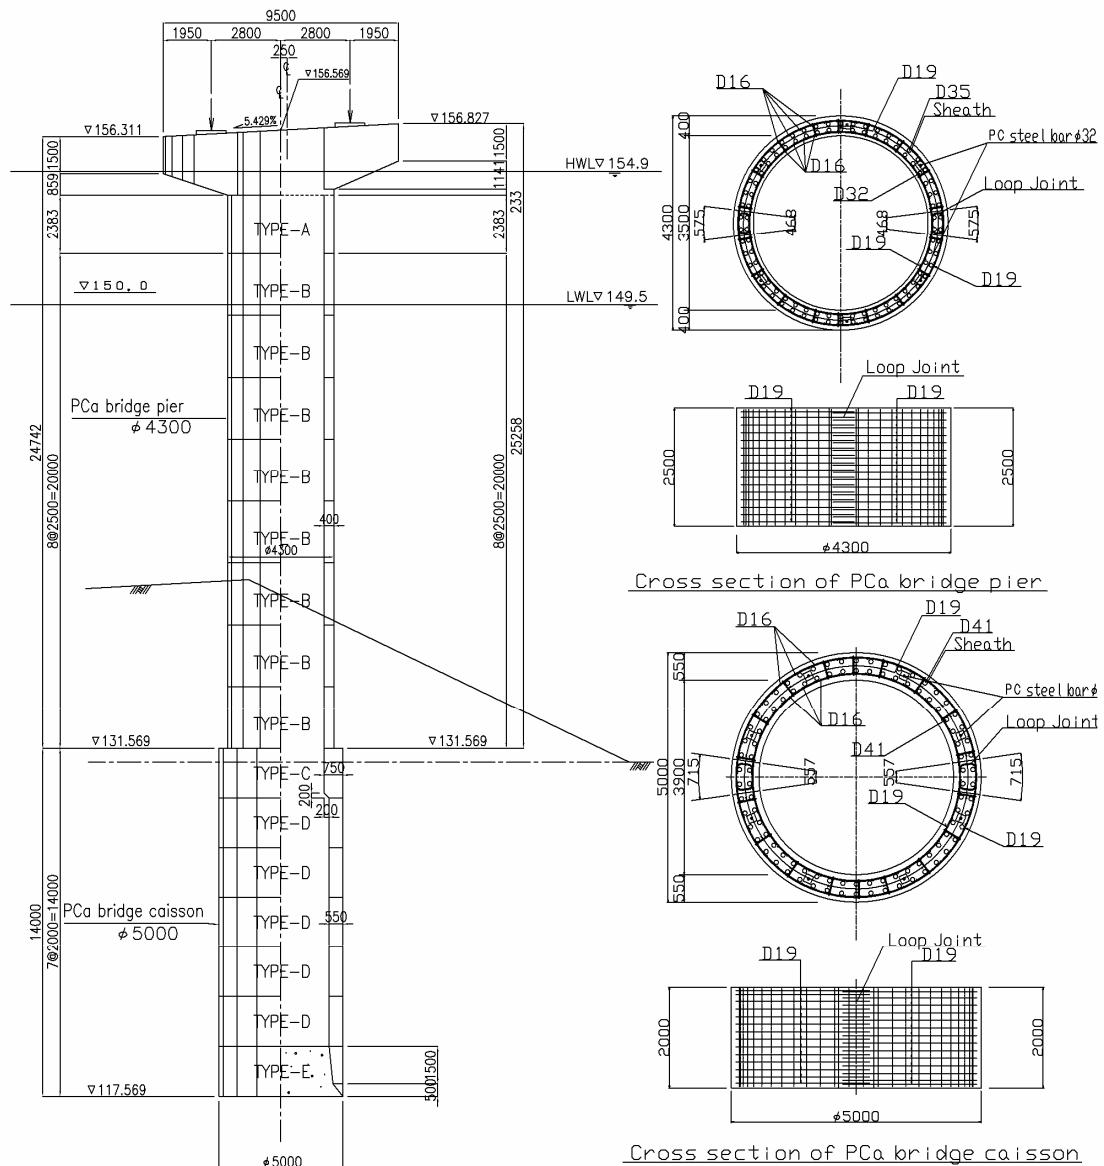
The segmental PCa bridge pier and caisson with loop joint
